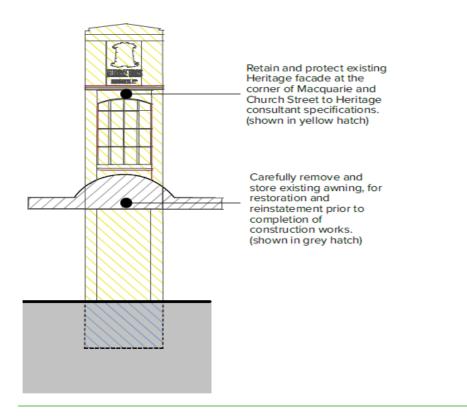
Extract from Demolition Plan- Church Street Heritage façade elevation
